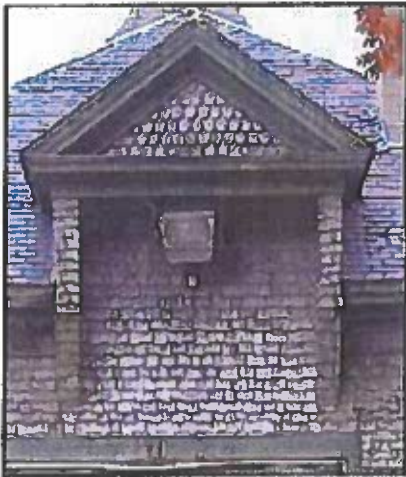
South facade dormer with shingled wall covering the original loft doors shown in photo 44 at right. Its original appearance matched the west facade dormer in photo 45 below.
